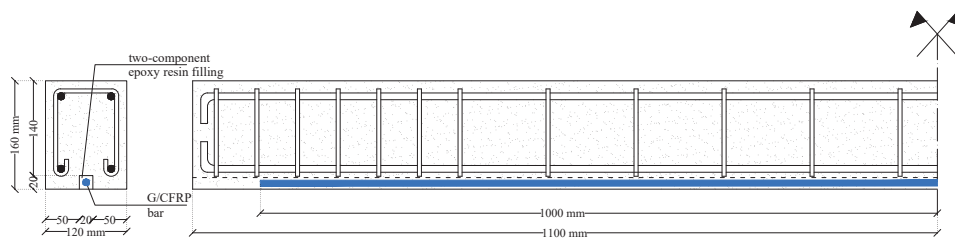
Longitudinal and transverse section of RC beam specimens in the strengthened condition
